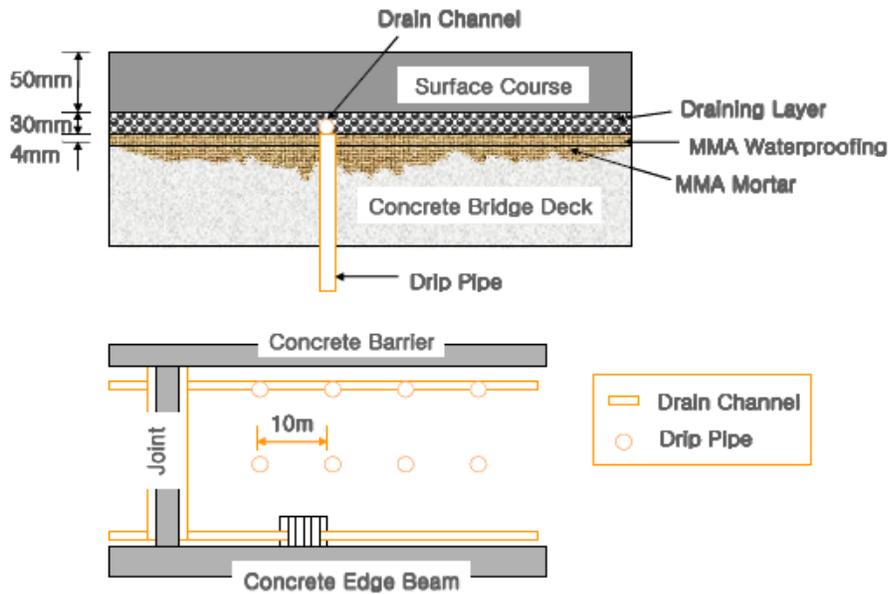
Section and plan view of bridge deck pavement with drainage system
